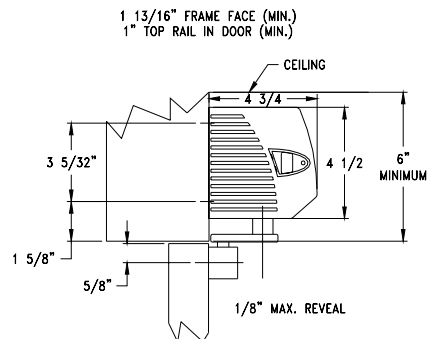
OPERATOR CLEARANCES – PULL ARM
